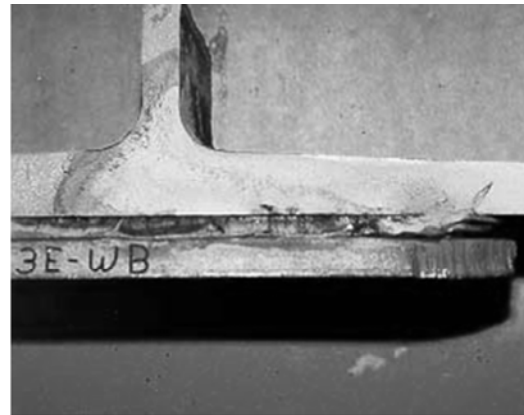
Air Hammer Peened Cover-plate End Weld Toe
